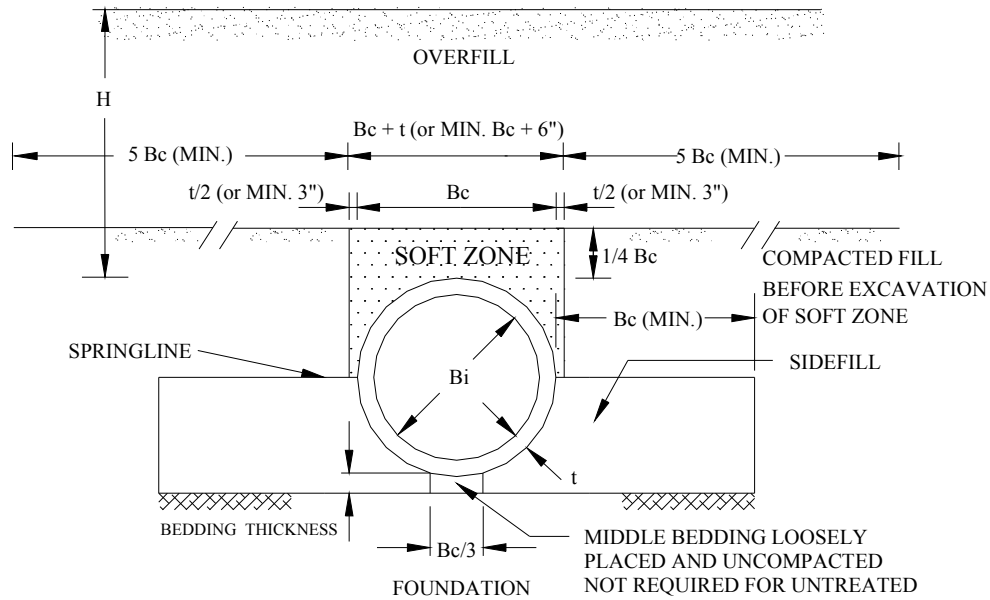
Geometry II of Soft Zone for Concrete Round Pipes
